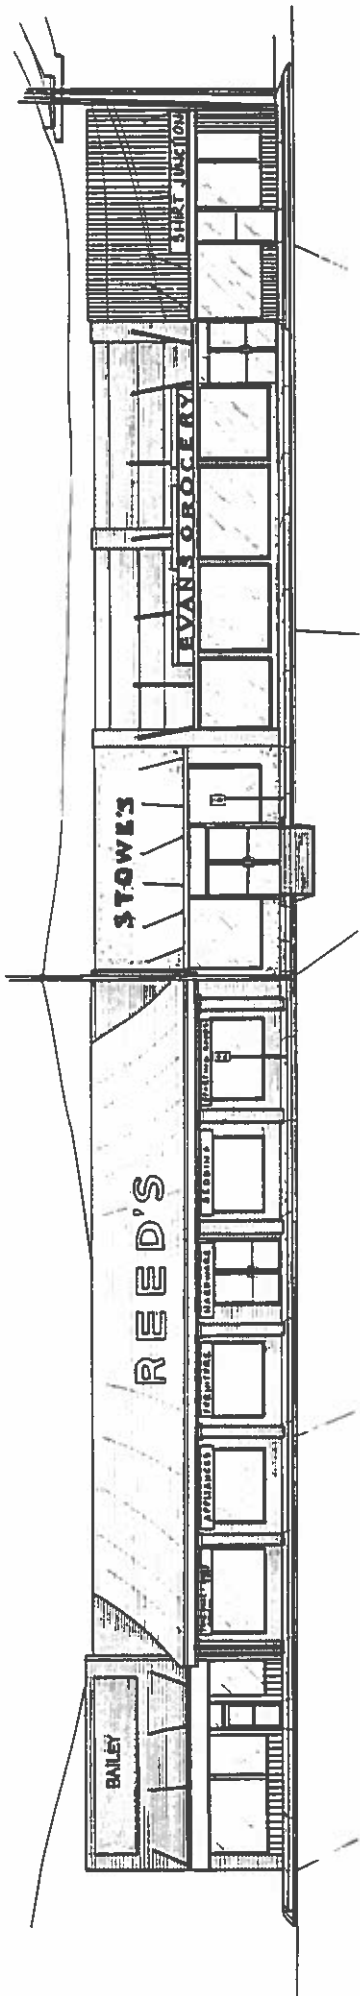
Building Facade Design Alternatives for Trinity Street - Looking to the South
